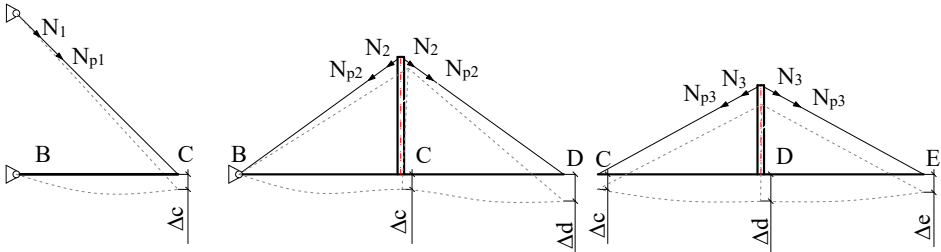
Cable stays and pylons, divided into triangular systems (made by the author)
